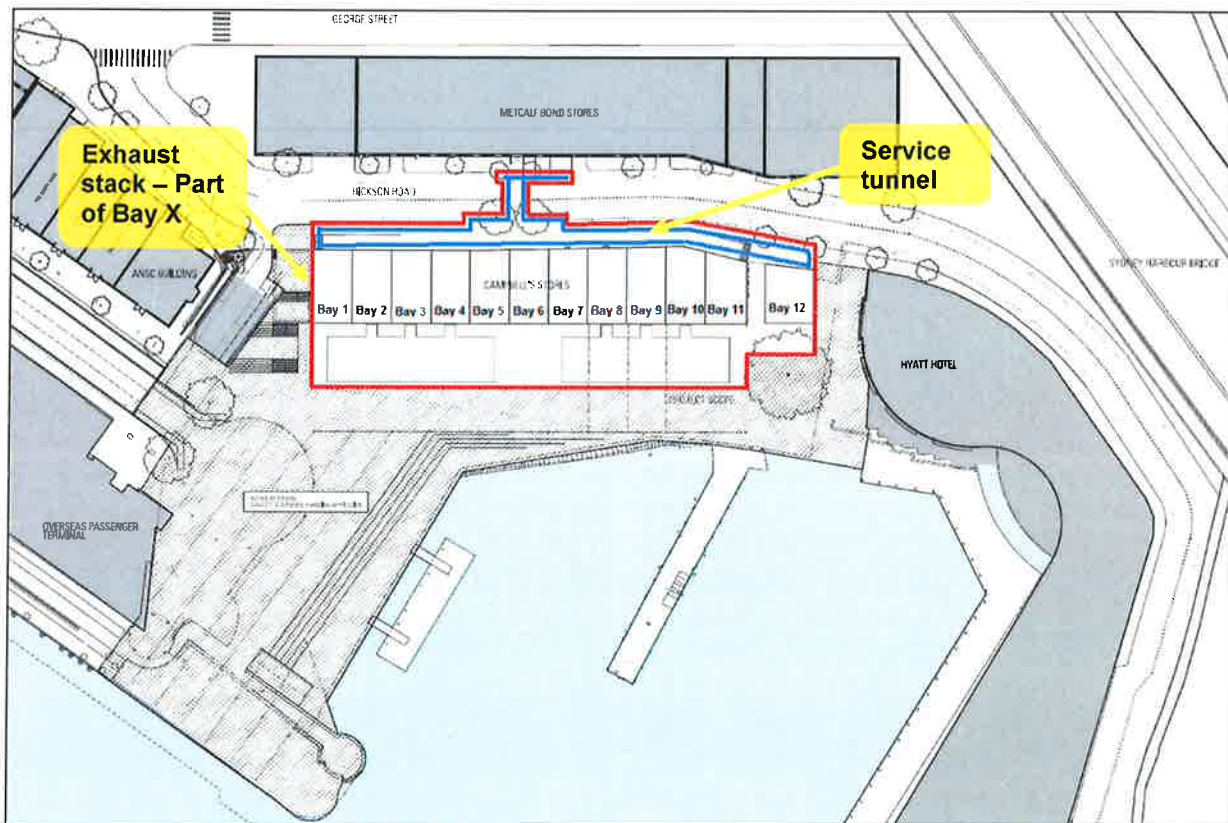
Project area outlined in red with Council's land outlined in blue (Source: Applicant's EIS).
